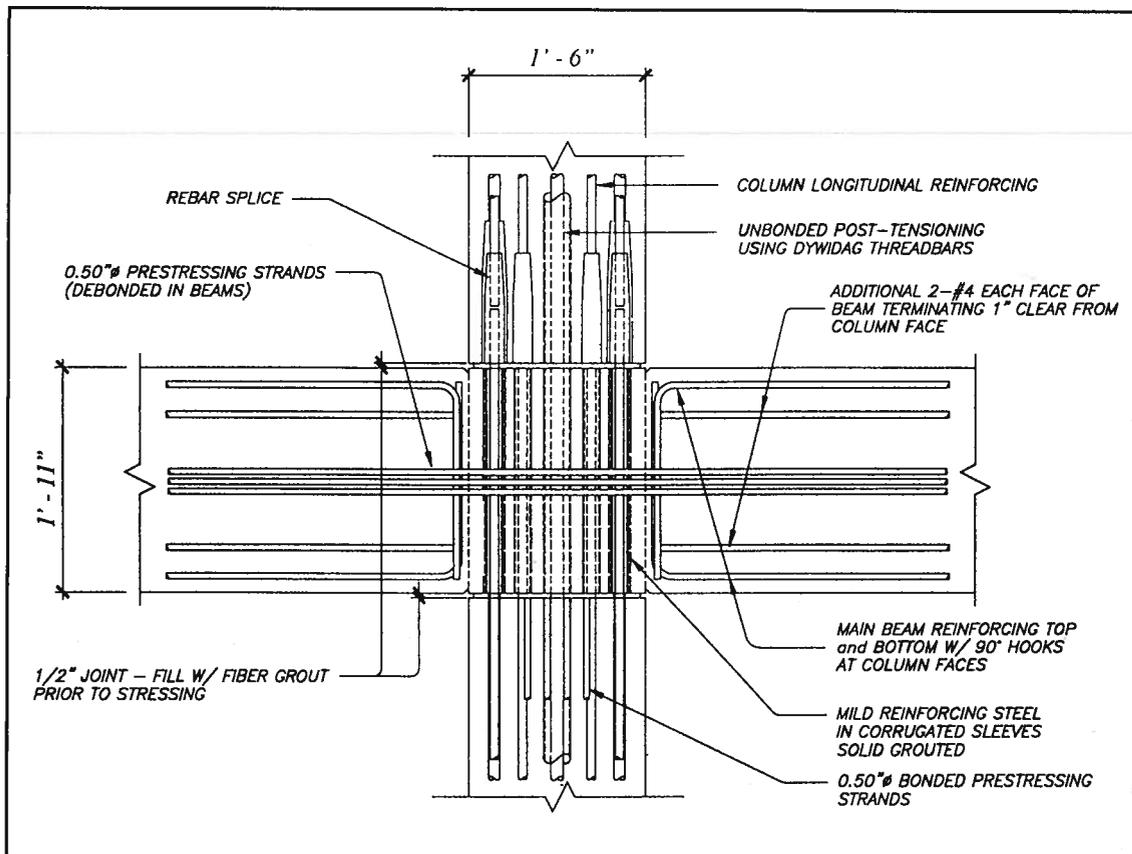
Idealization of interior column pretensioned connection used in the PRESS Test Building (transverse joint reinforcement not shown for clarity only).
